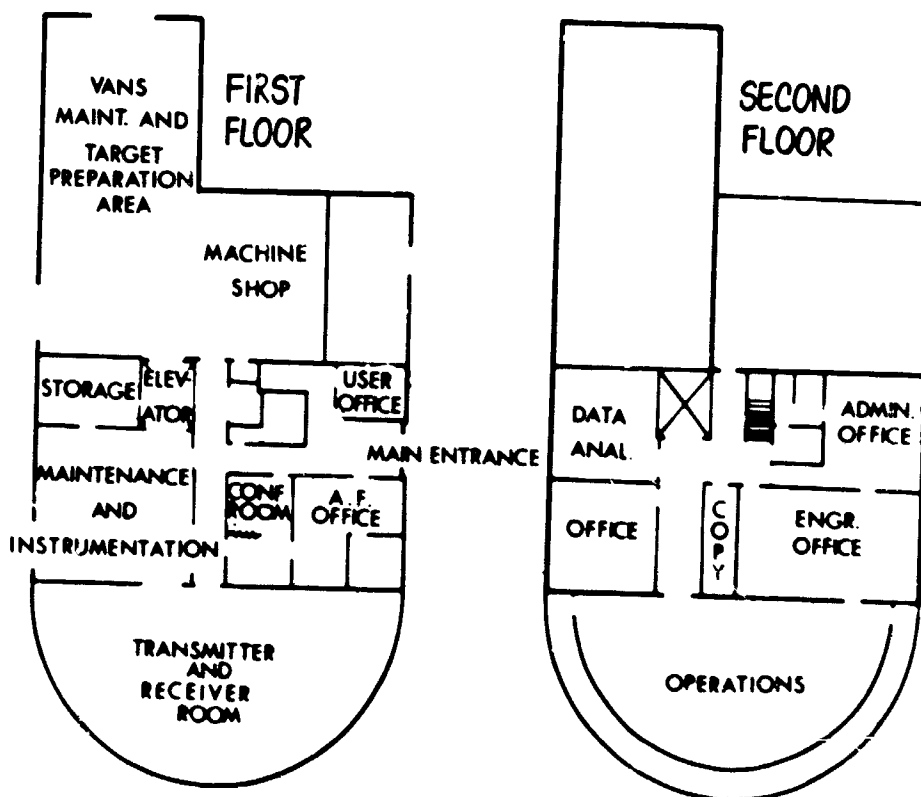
FLOOR PLAN - OPERATIONS BUILDING
